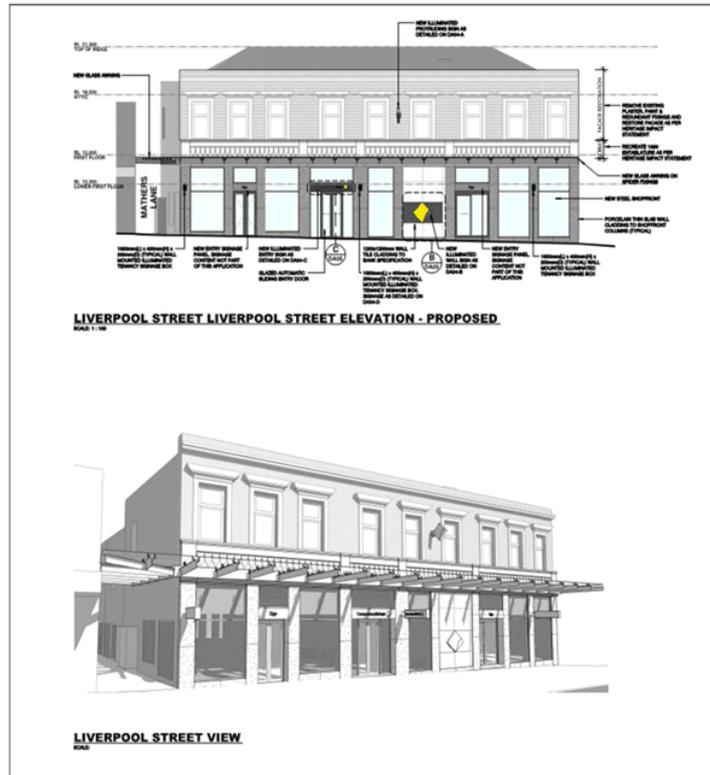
Proposed Liverpool Street elevation and streetview illustrating alterations and signage.
